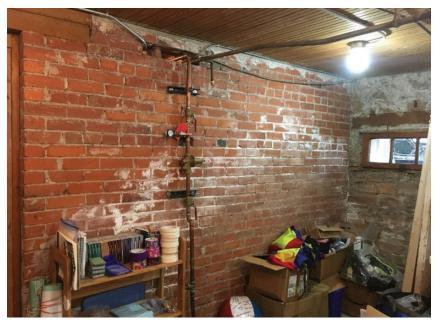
Efflorescence on basement walls, 2020 (source: JVA)
